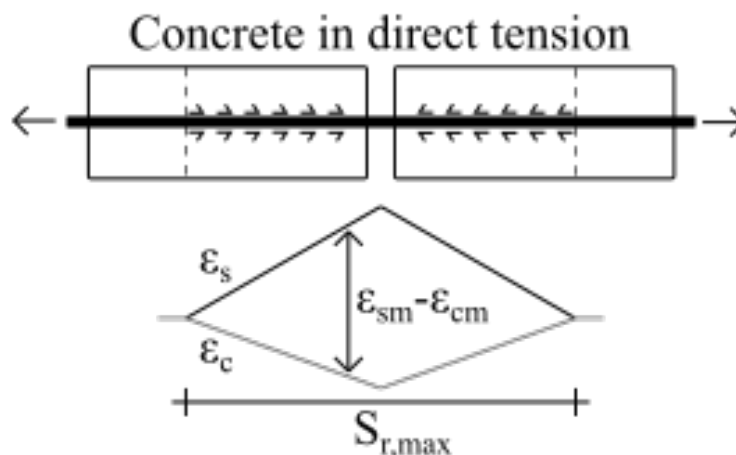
Illustration of maximum crack spacing in reinforced concrete.
